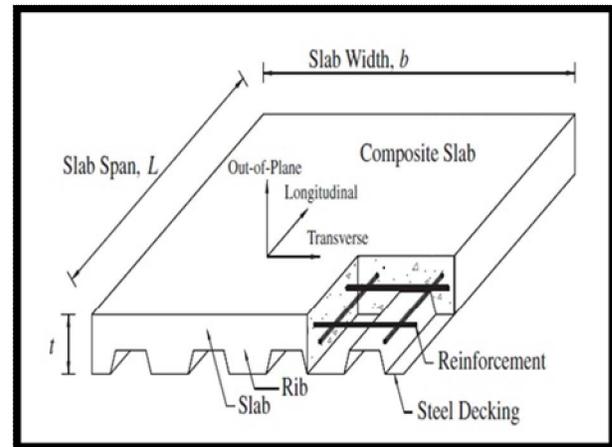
Elements of Composite Slab with Profiled Steel Decking
